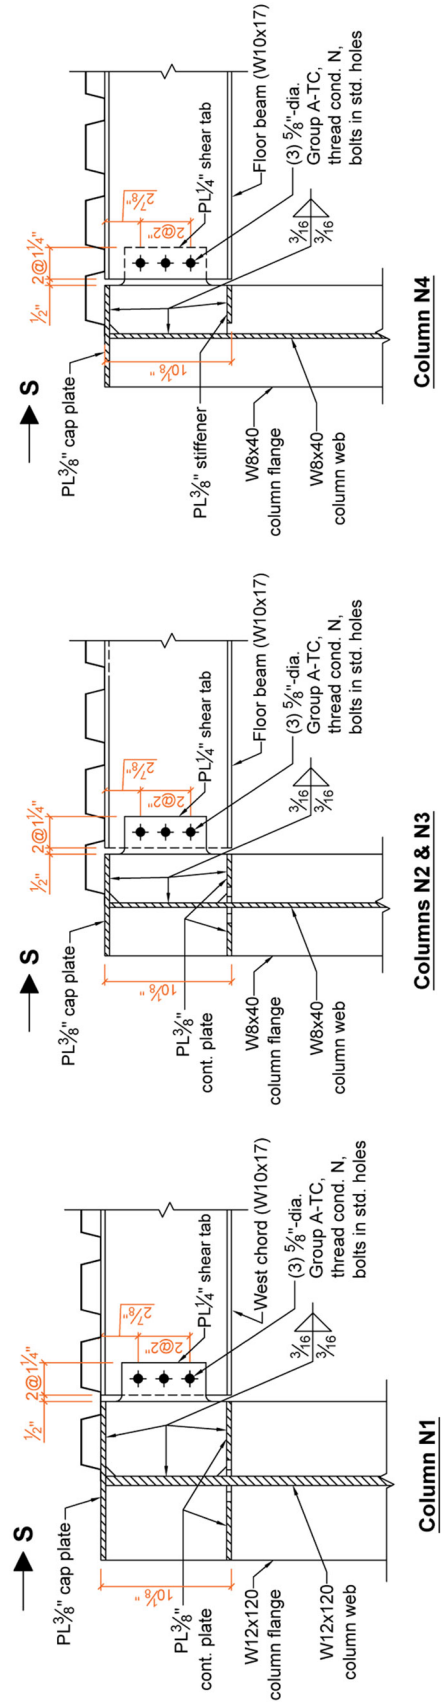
Phase 2 Test Building: Roof Collector-to-Column Connections at Column 4
